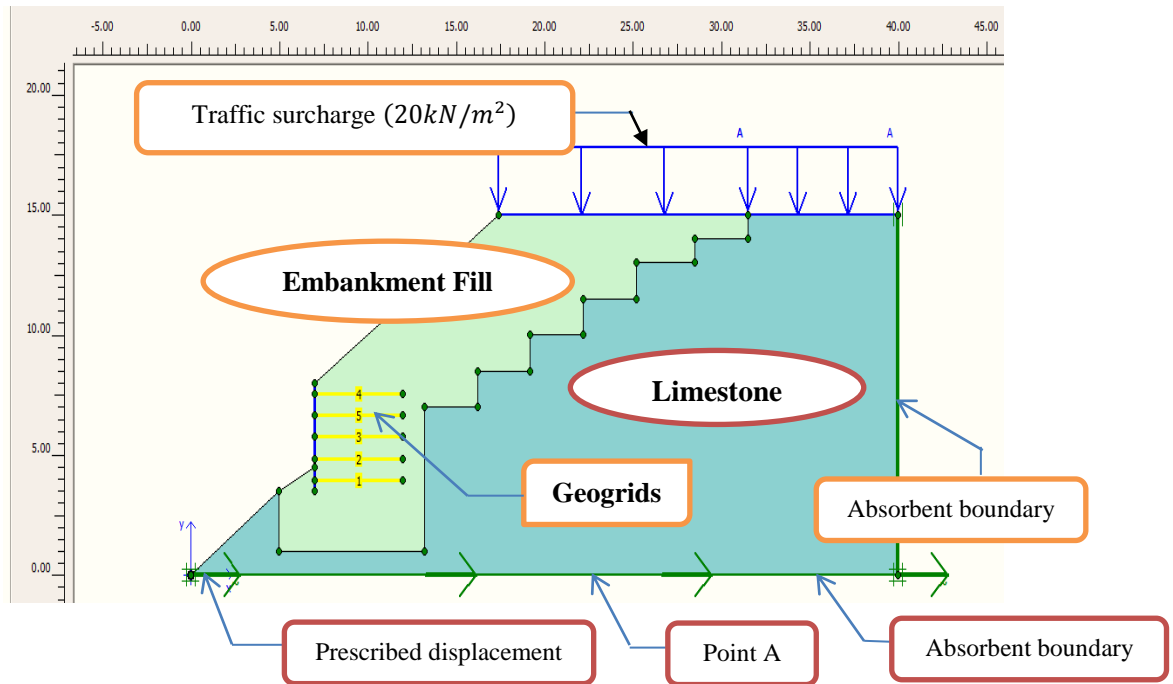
The Assumed Soil Profile below the Reinforced Wall Section
